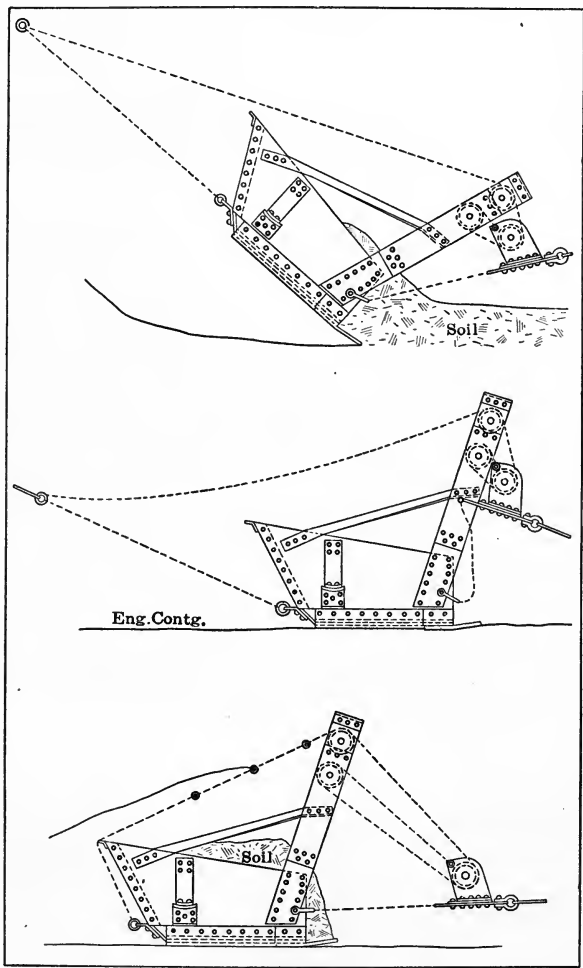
“Weeks” drag-line bucket. (Courtesy of Engineering-Contracting.)
